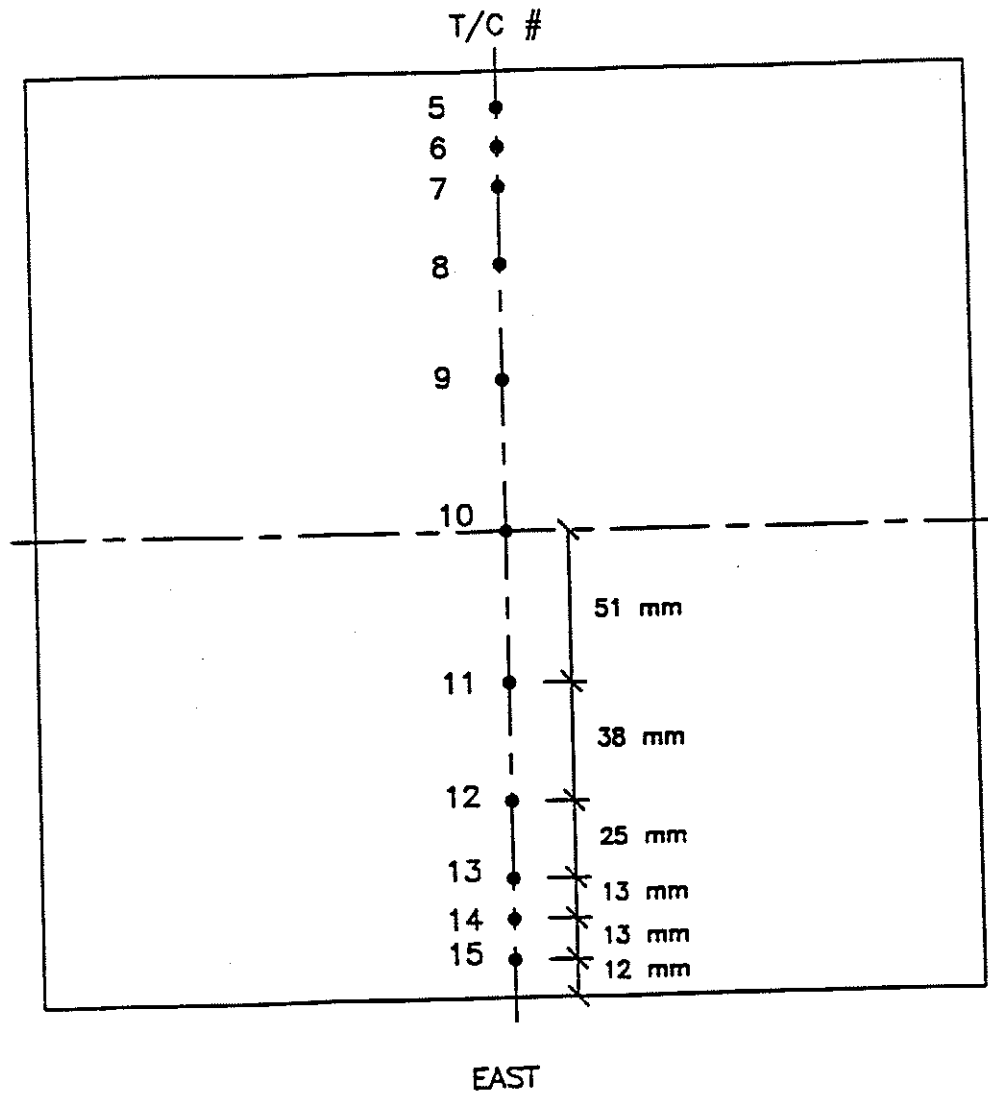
Locations of Thermocouples at Mid-Height Section: Column 2 (TFRI)
